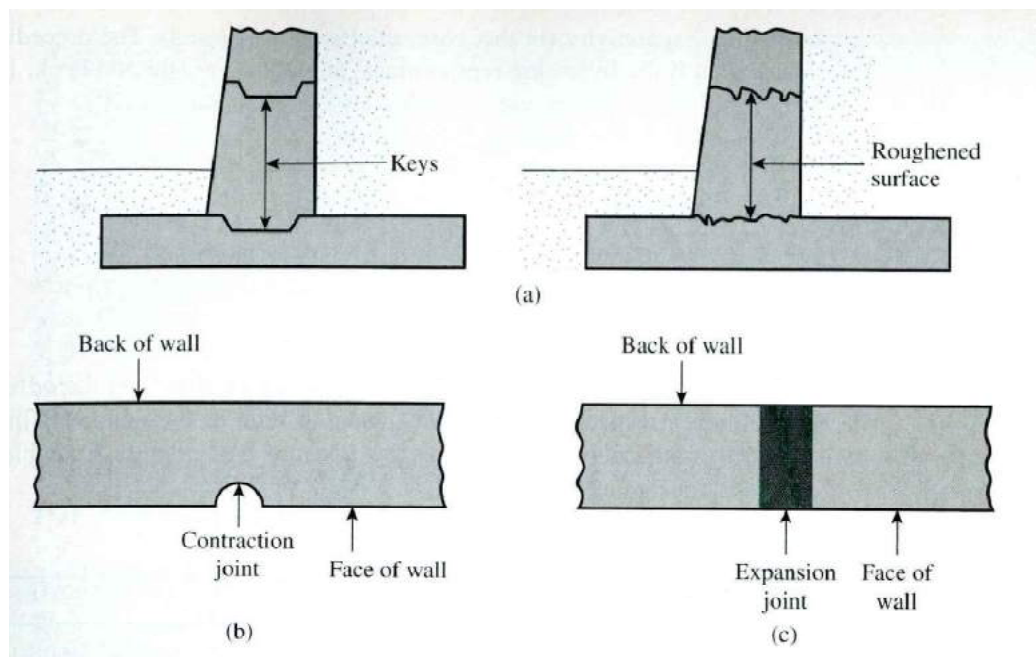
(a) Construction joints; (b) contraction joint; (c) expansion joint
